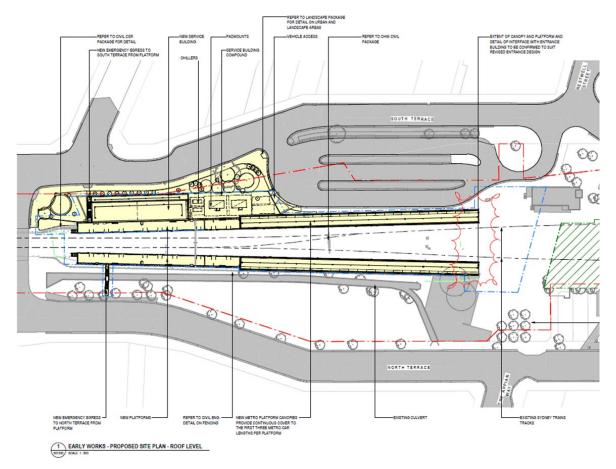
Bankstown Early Works scope (source: Metro T2M – Bankstown Station Design & Precinct Plan – Sydney Metro Southwest Metro Design Services, 2021)
